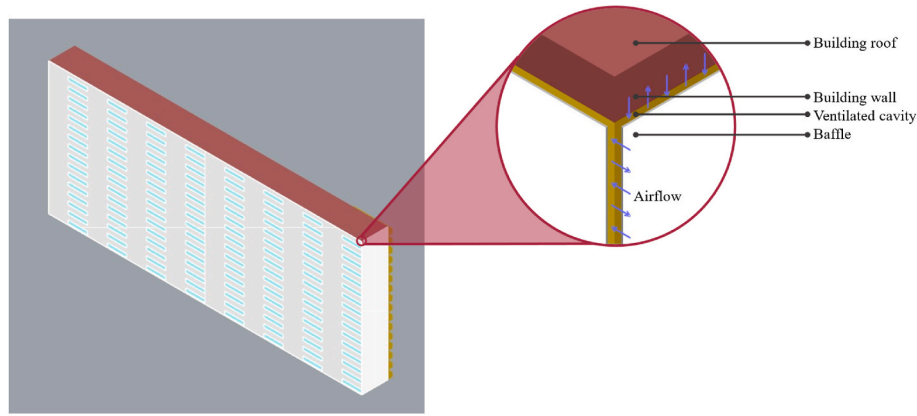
Ventilated cavity skin components and layout when applied to the building envelope. The ventilated cavity skin includes an additional layer known as a baffle, as well as a ventilated cavity, installed over the general building wall.
